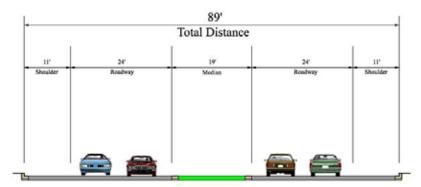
Charles Street, between Bellona Road and Greenway Avenue
